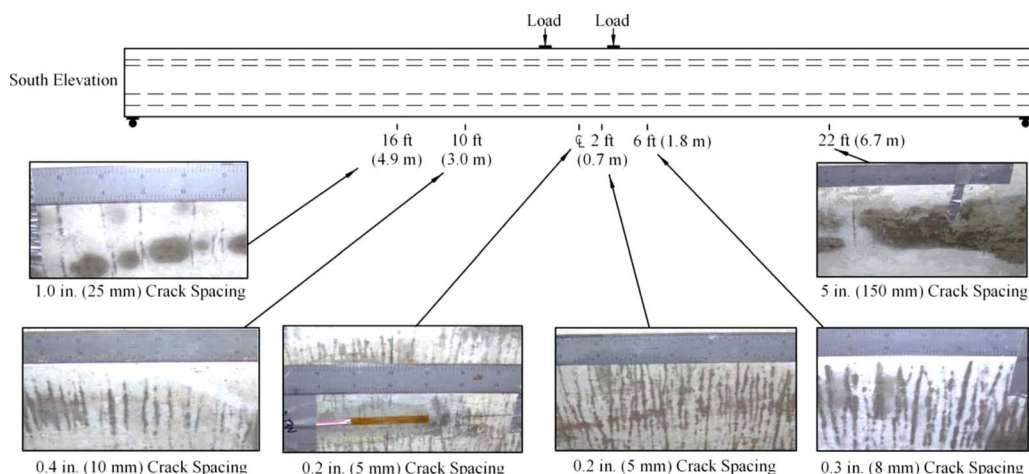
Crack spacing on bottom flange of girder after 12 in. (305 mm) of midspan deflection
